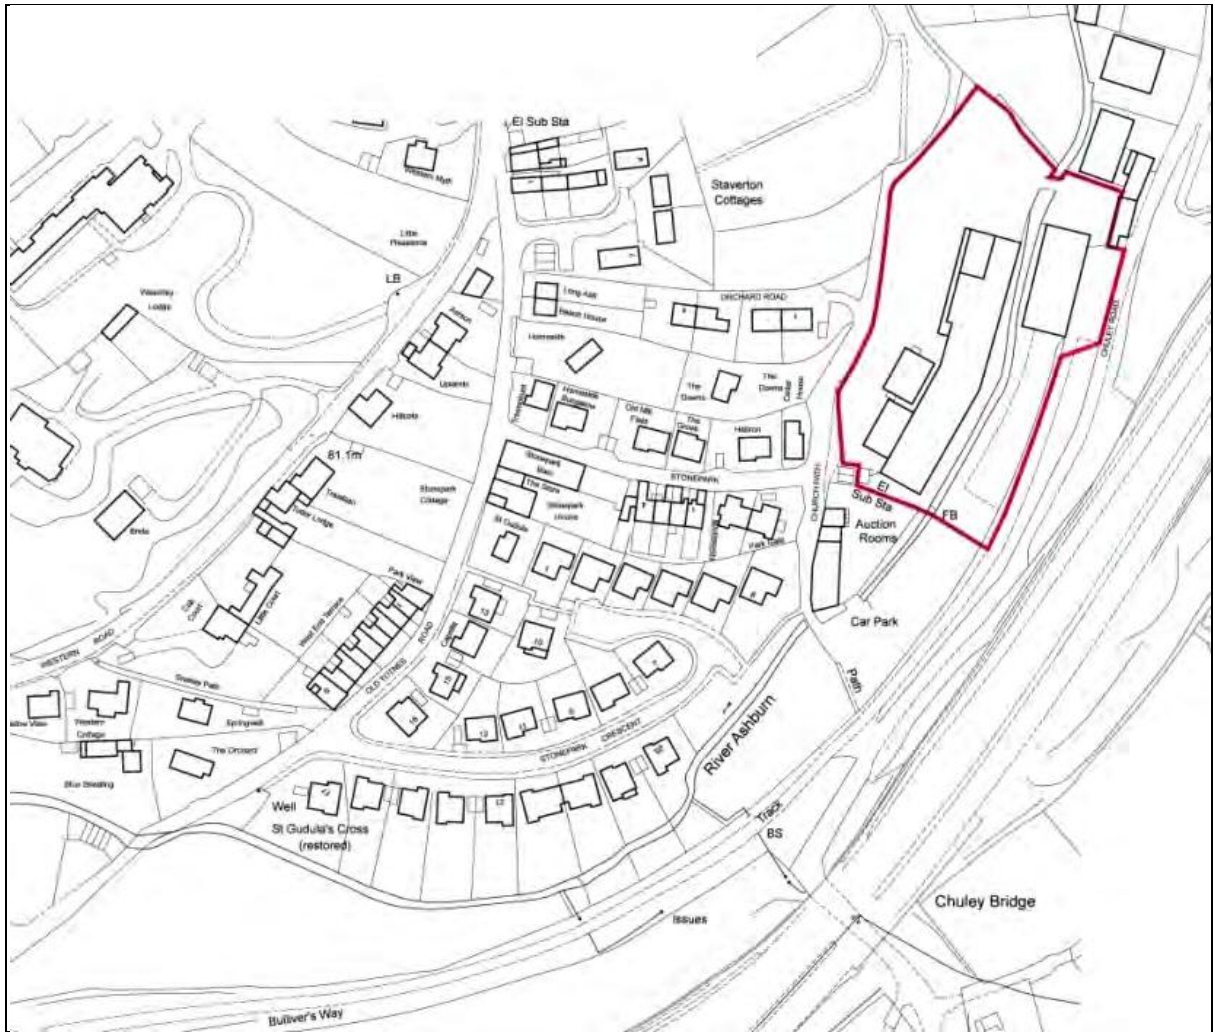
Detailed site plan, the site boundary is marked in red (courtesy: GJR Architects).
